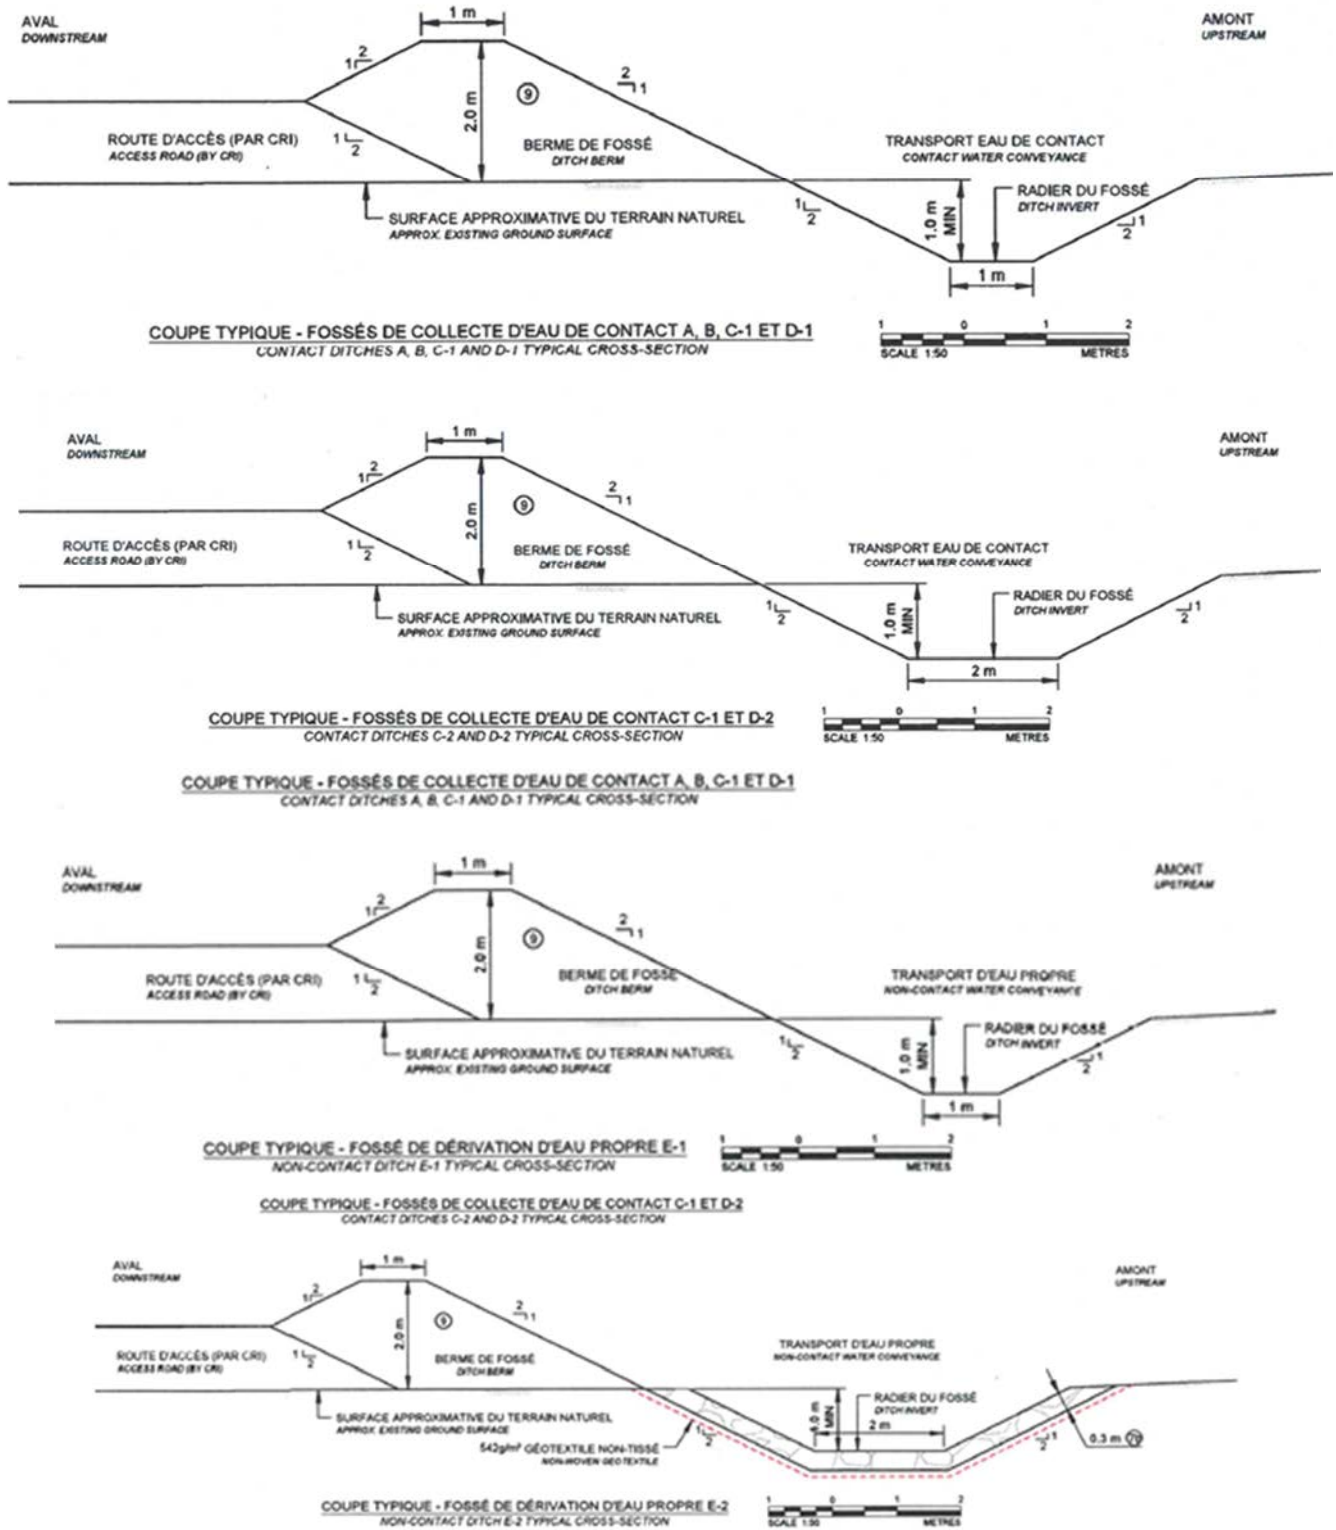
Typical Cross-Sections of Non-Contact Water Diversion and Contact (Contaminated Water) Collection Ditches
